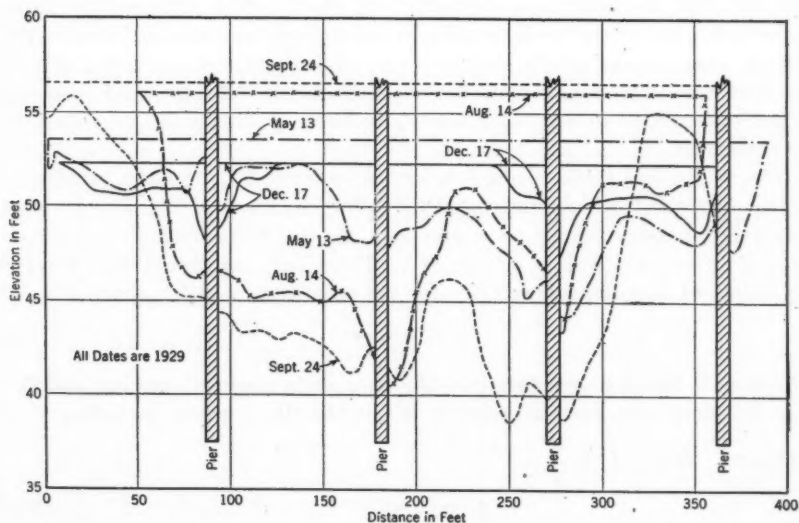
TYPICAL CROSS-SECTIONS OF RIO GRANDE, AT SAN MARCIAL, NEW MEXICO.
